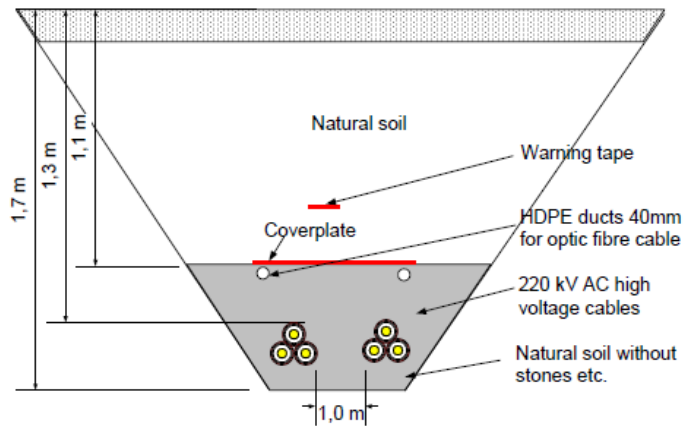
Cross view typical 220 kV AC cable trench Eemshaven
